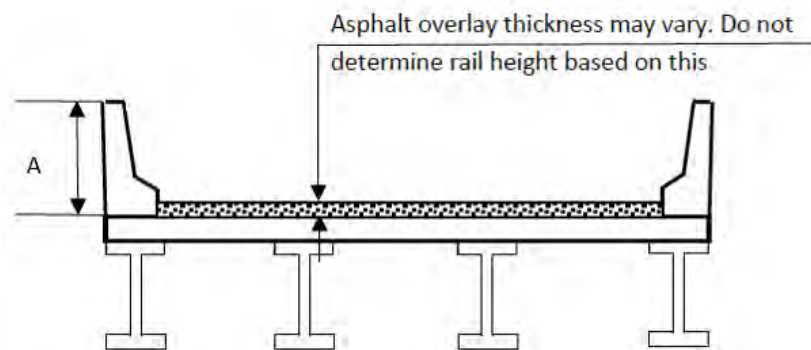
Cross-section view of typical asphalt wearing surface over concrete deck
